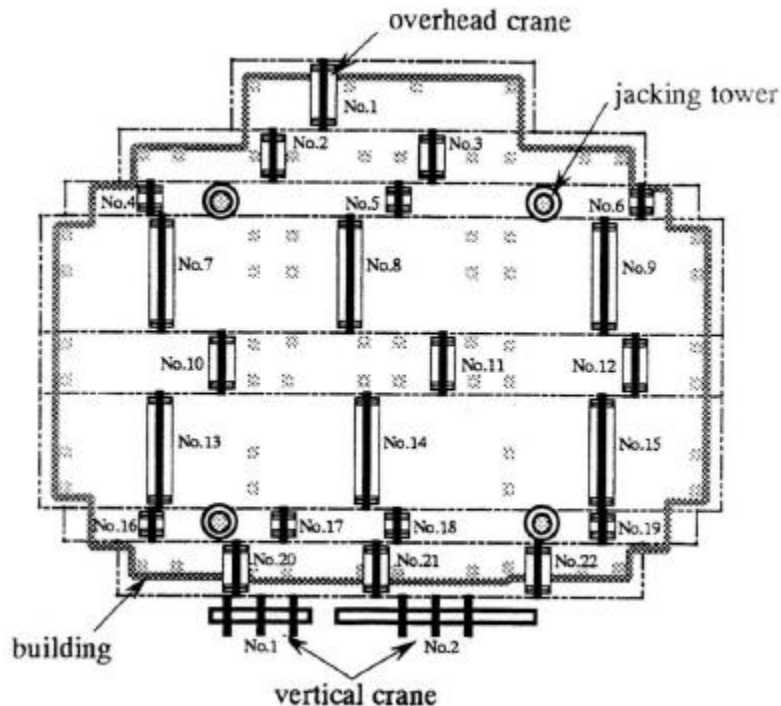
Layout of the SMART System at the Yokohama building [Maeda 1997]
